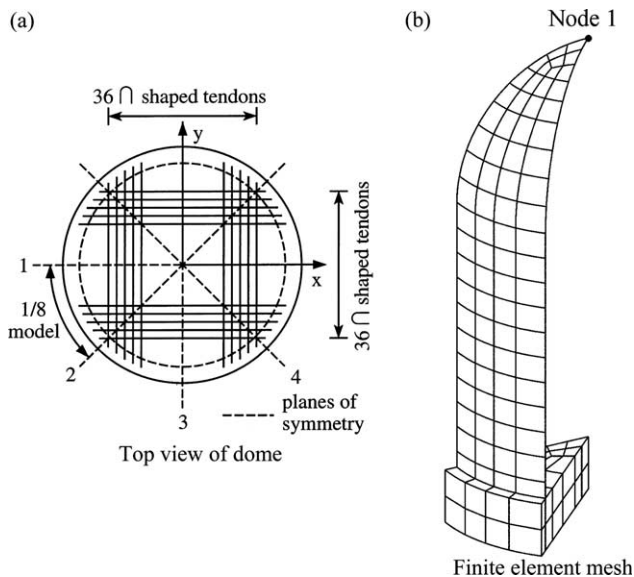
1/8 model of the PWR prestressed concrete containment of Maanshan nuclear power plant.
